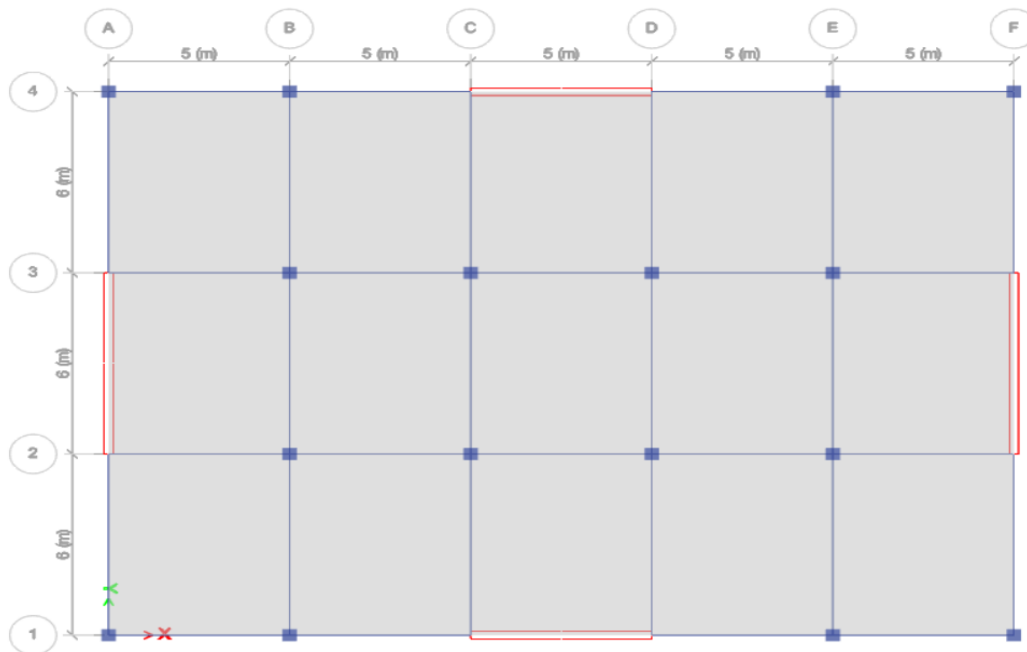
Typical plan of all buildings upto G+19 with 0.56% and 0.67% structural wall plan density in X and Y-Direction respectively.
